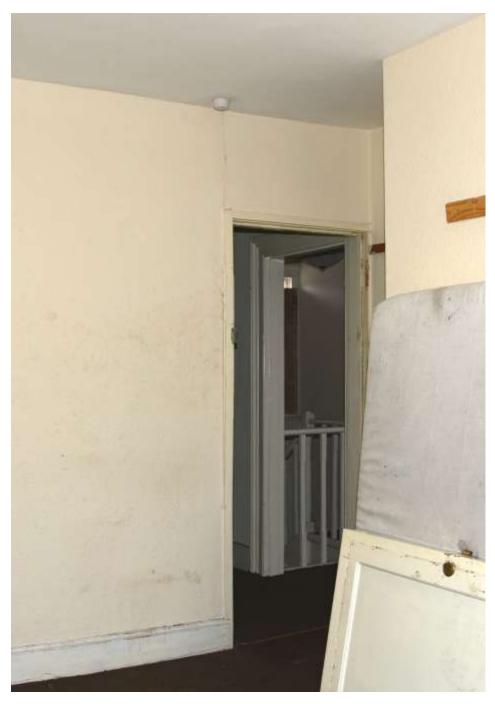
The northwestern bedroom, looking back towards the landing. The doorframe appears quite modern – much simpler than elsewhere – and was presumably cut through when the small central room was created
